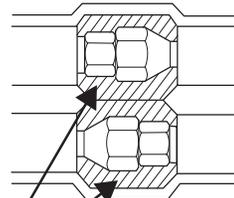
Typical Refrigerant Flare Fitting Insulation Detail.
